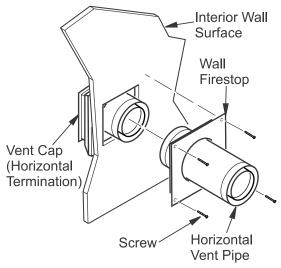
Connecting Vent Cap with Horizontal Vent Pipe
